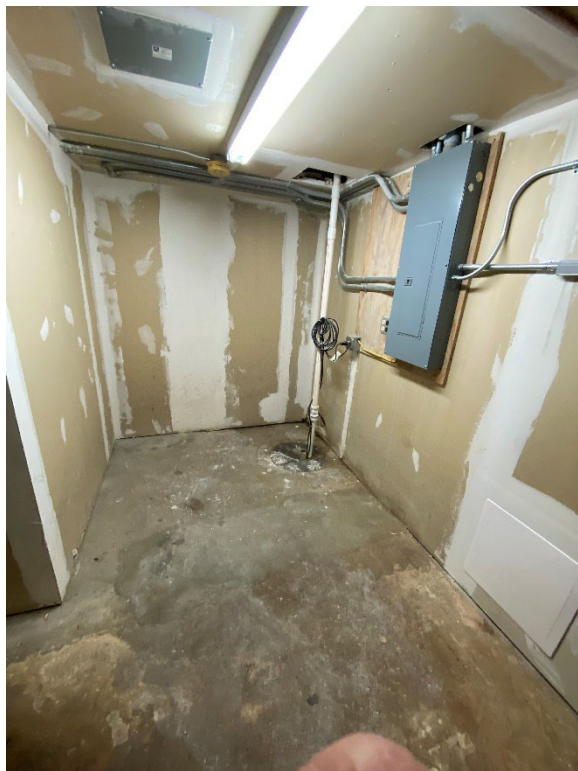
Sealed sump pump in building basement (3/4/2022)
